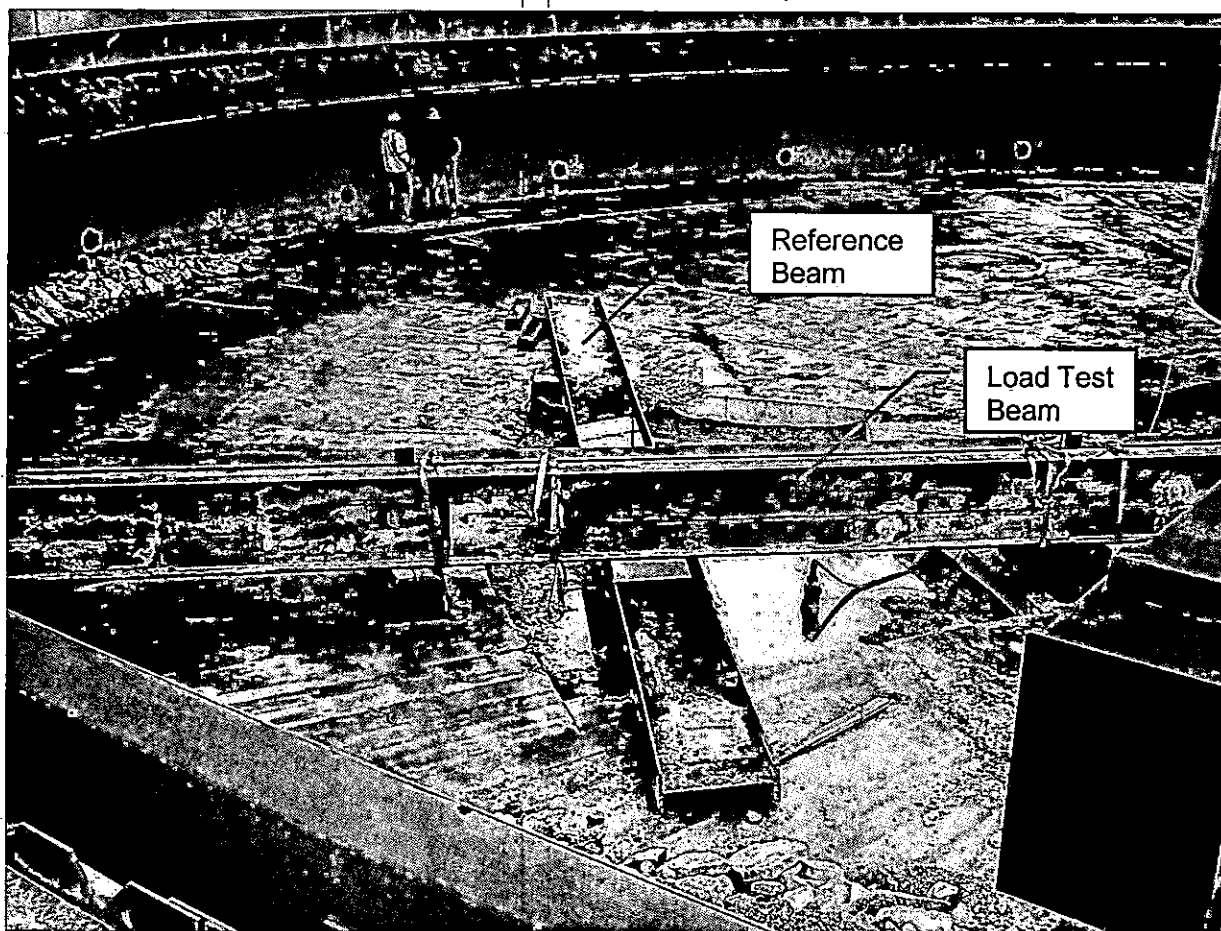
Removed clarifier slab around anchors to be tested with load test beam and reference beam (photograph courtesy of Hazen from March 27, 2018).
